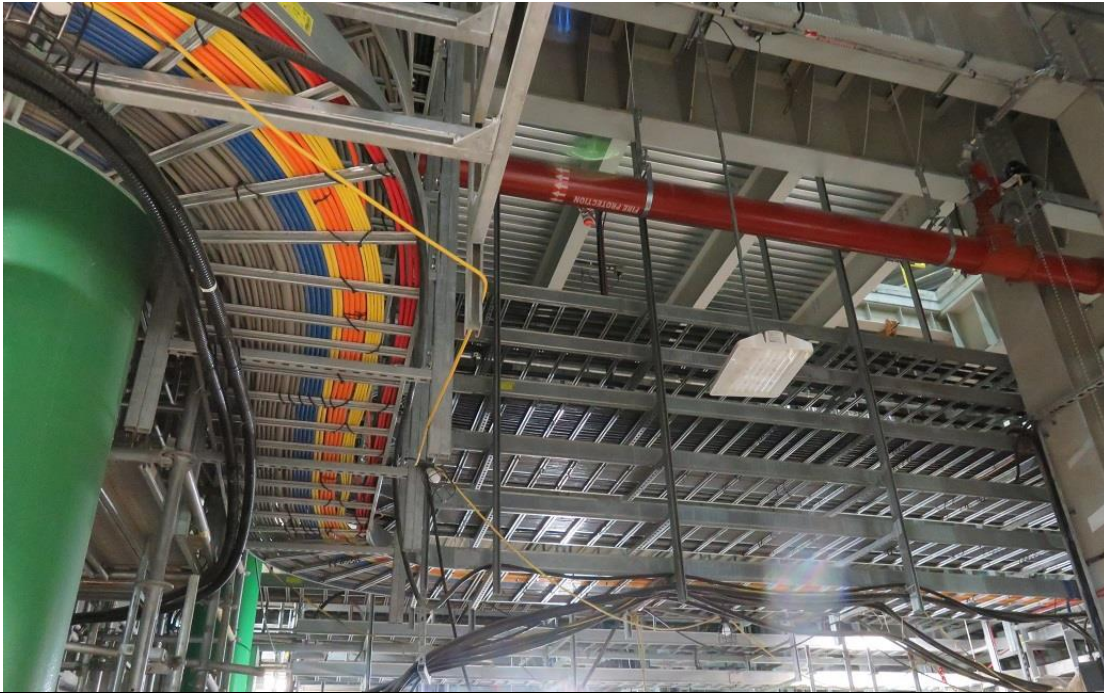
Typical view of balance of plant cabling installation; red pipe at upper right is fire protection water line.
